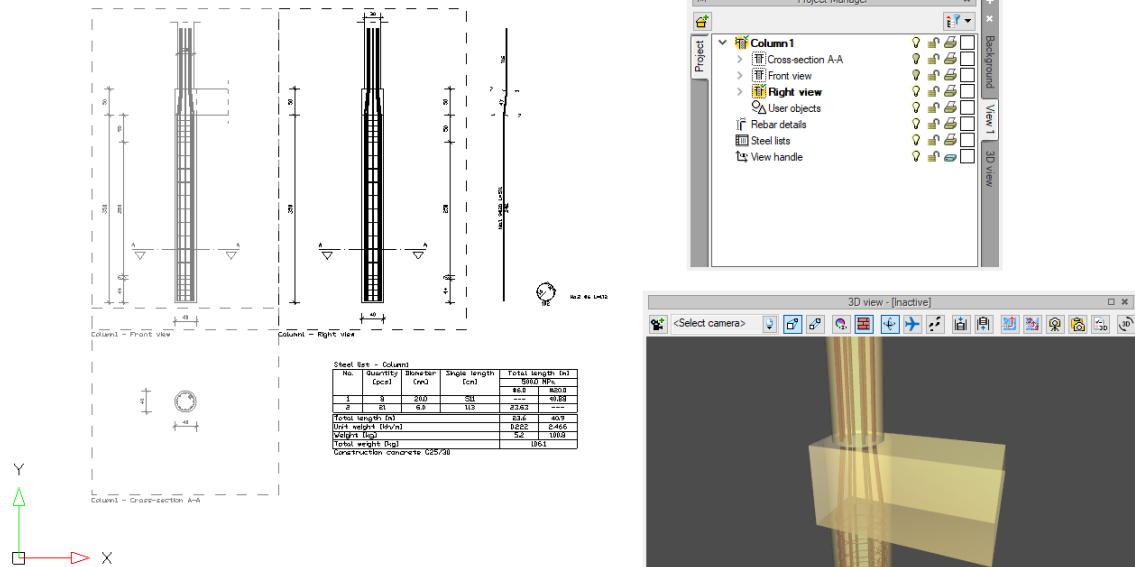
Example drawings of the columns and 3D model view created in ArCADia-REINFORCED CONCRETE COLUMN application.
